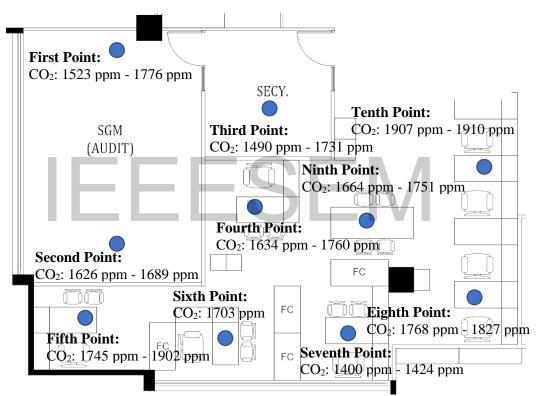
SGM (Audit)+Working in the Third Floor Plan (SNGPL) Source: Head Office SNGPL, Lahore
